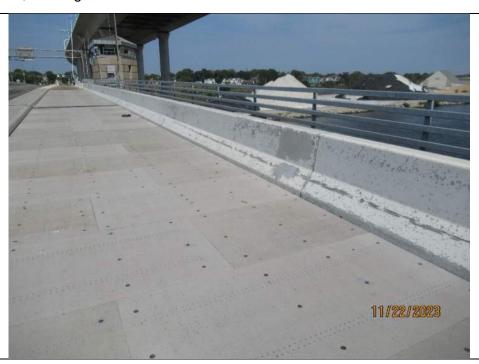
[Span 5] -South leaf, East roadway / trail steel barrier, generally good condition with flaking and peeling paint, Looking Northeast
